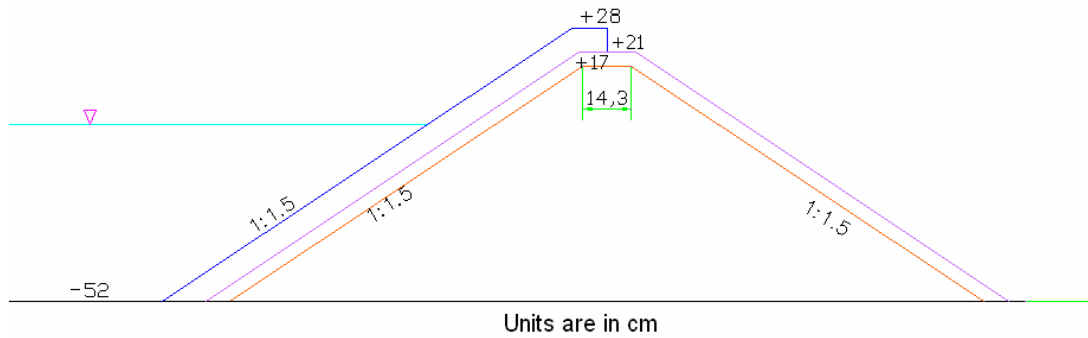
Cross-section of the model with the slope of 1:1.5
